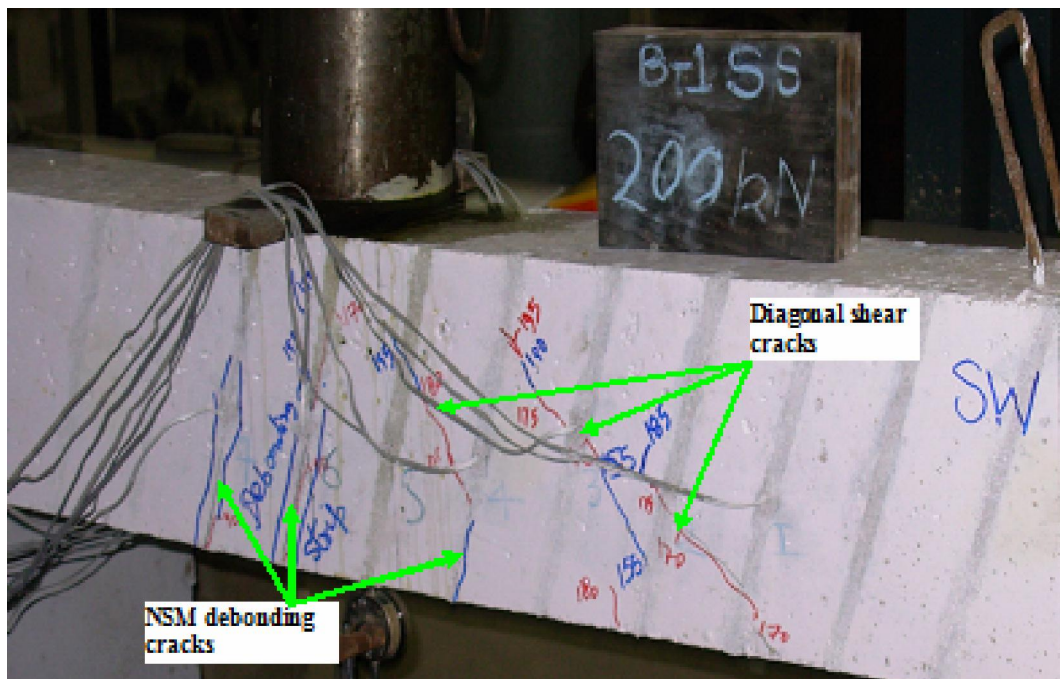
Test B1-SS final failure crack pattern at 200 kN (Face SW)
